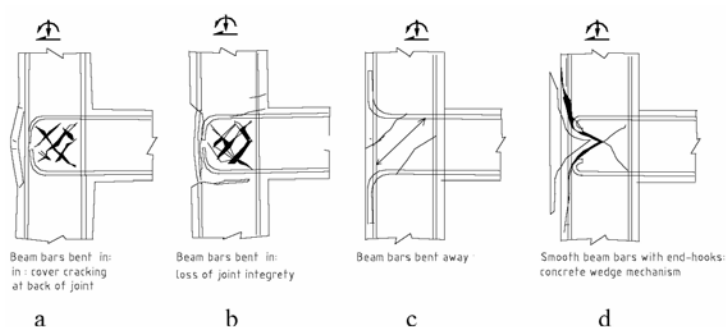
Typical anchorage details for beam-column joints Pampanin, et al. (2003)
